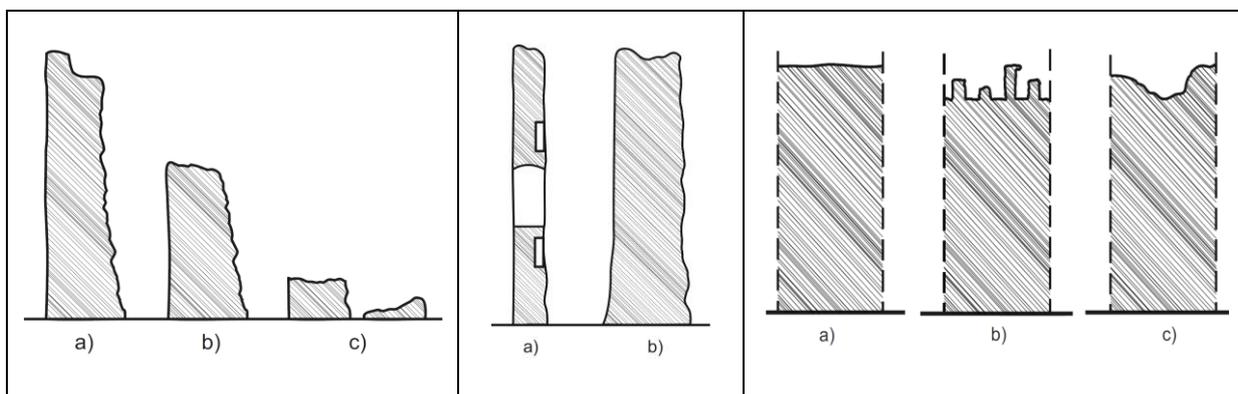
The division of walls with respect to height: a) a high wall, b) a medium wall, c) a low wall
